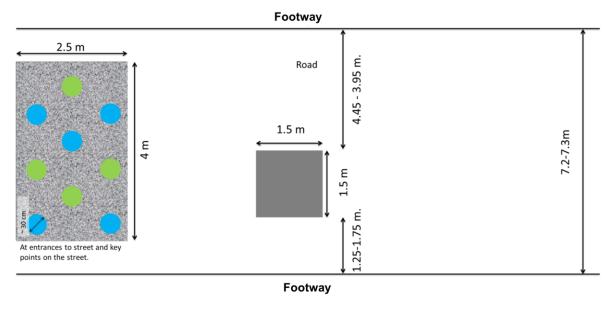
Hillsdon Road – Design of Community Corner, Carriageway details
